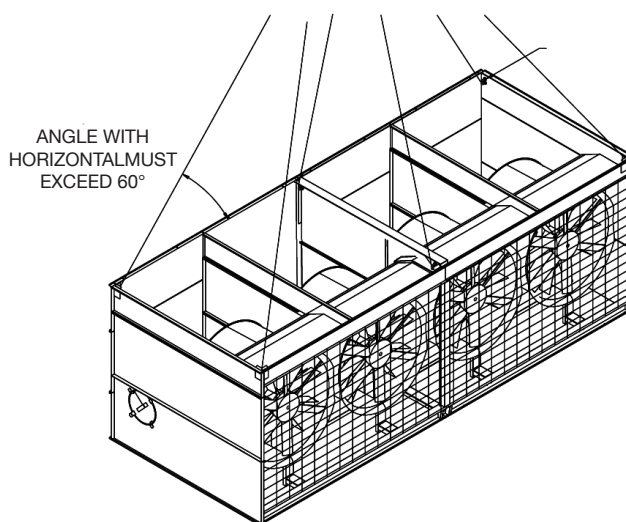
Pan - Fan Section (over 6,1 m Long)
